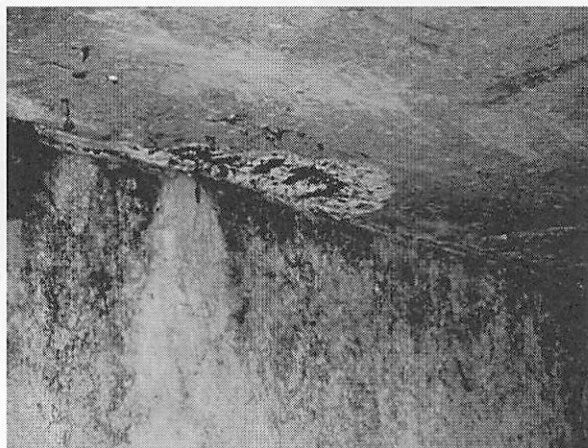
Corrosion of re-bar found at the connection between slab and wall
